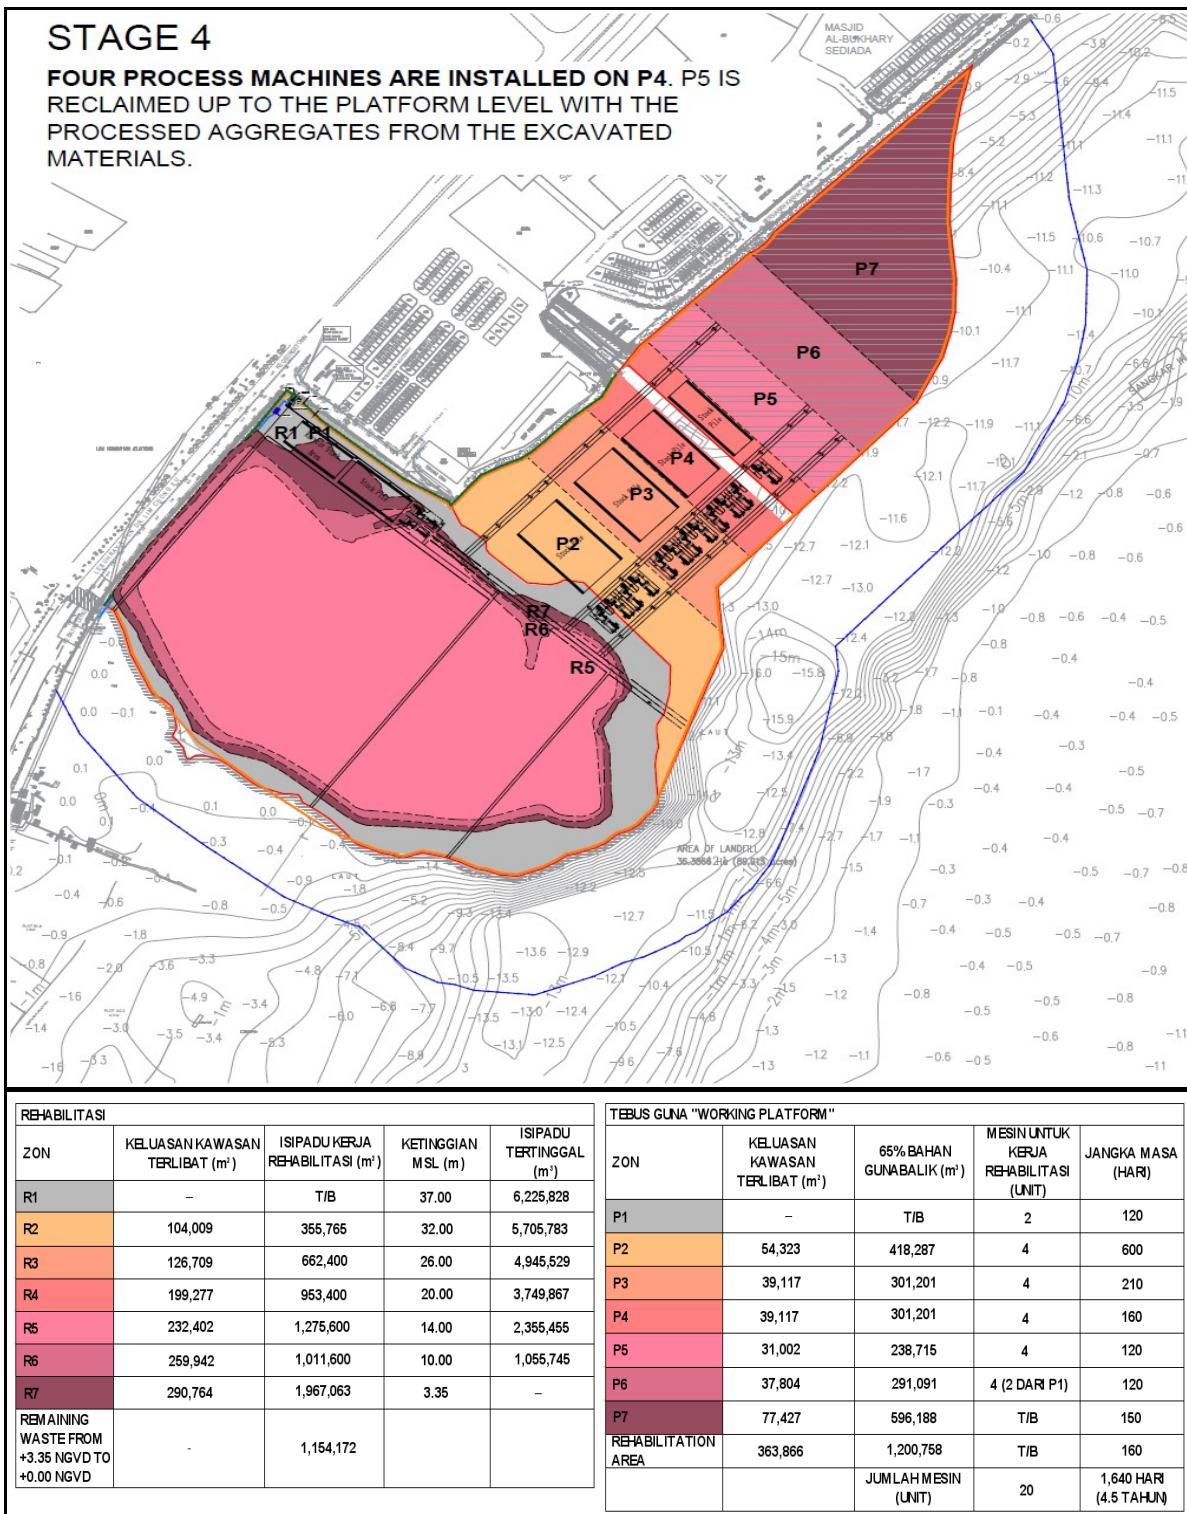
Layout Plan For Stage 4 Recycling Area On Jelutong Landfill
